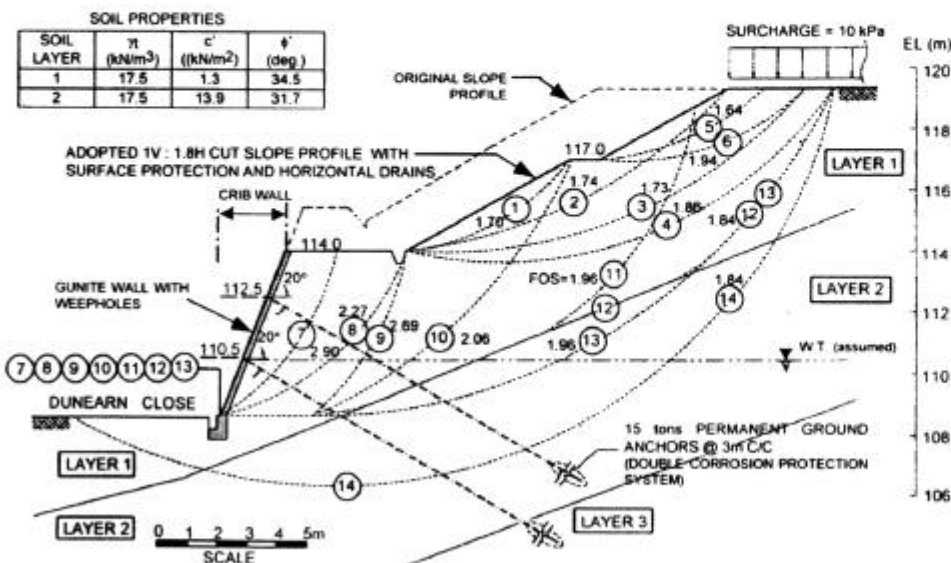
Stability analysis of permanent stabilization scheme (Section C-C).
